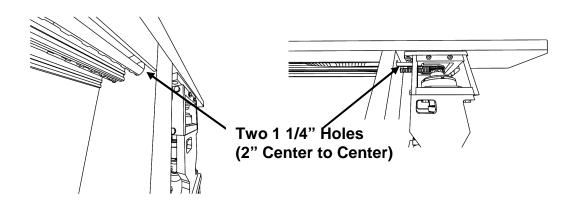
Holes Needed for Drive Belt Path for <u>Outside Door Pocket</u> Installation for One Way and 90°Doors
